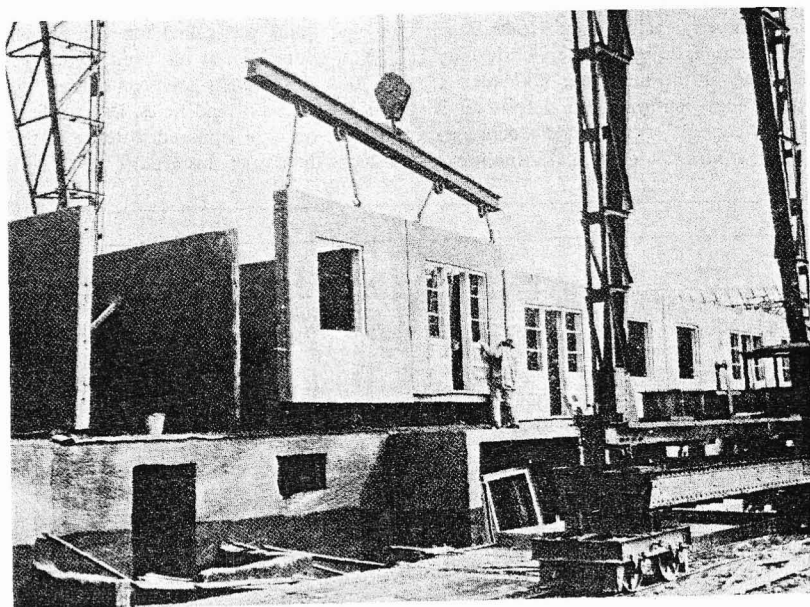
Occident reinforced concrete construction system: hoisting of the wall panels by crane.
